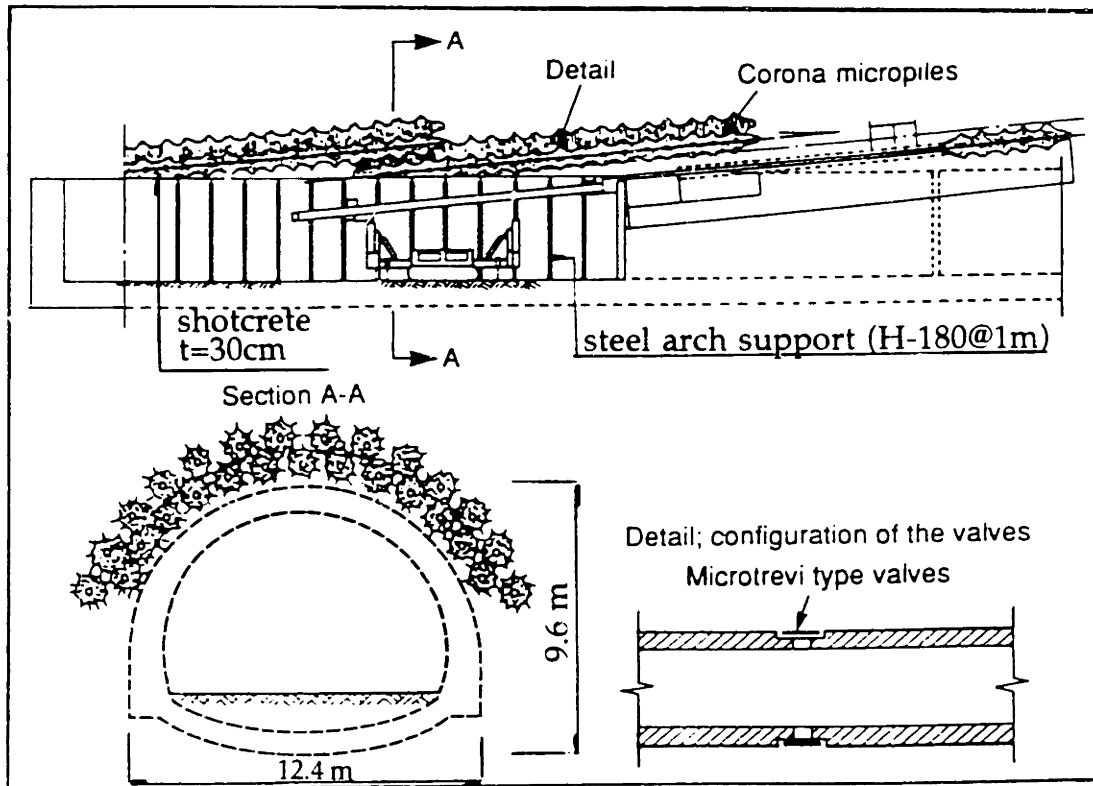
Cross and longitudinal sections: Ramat Tunnel (Pelizza et al., 1990)
